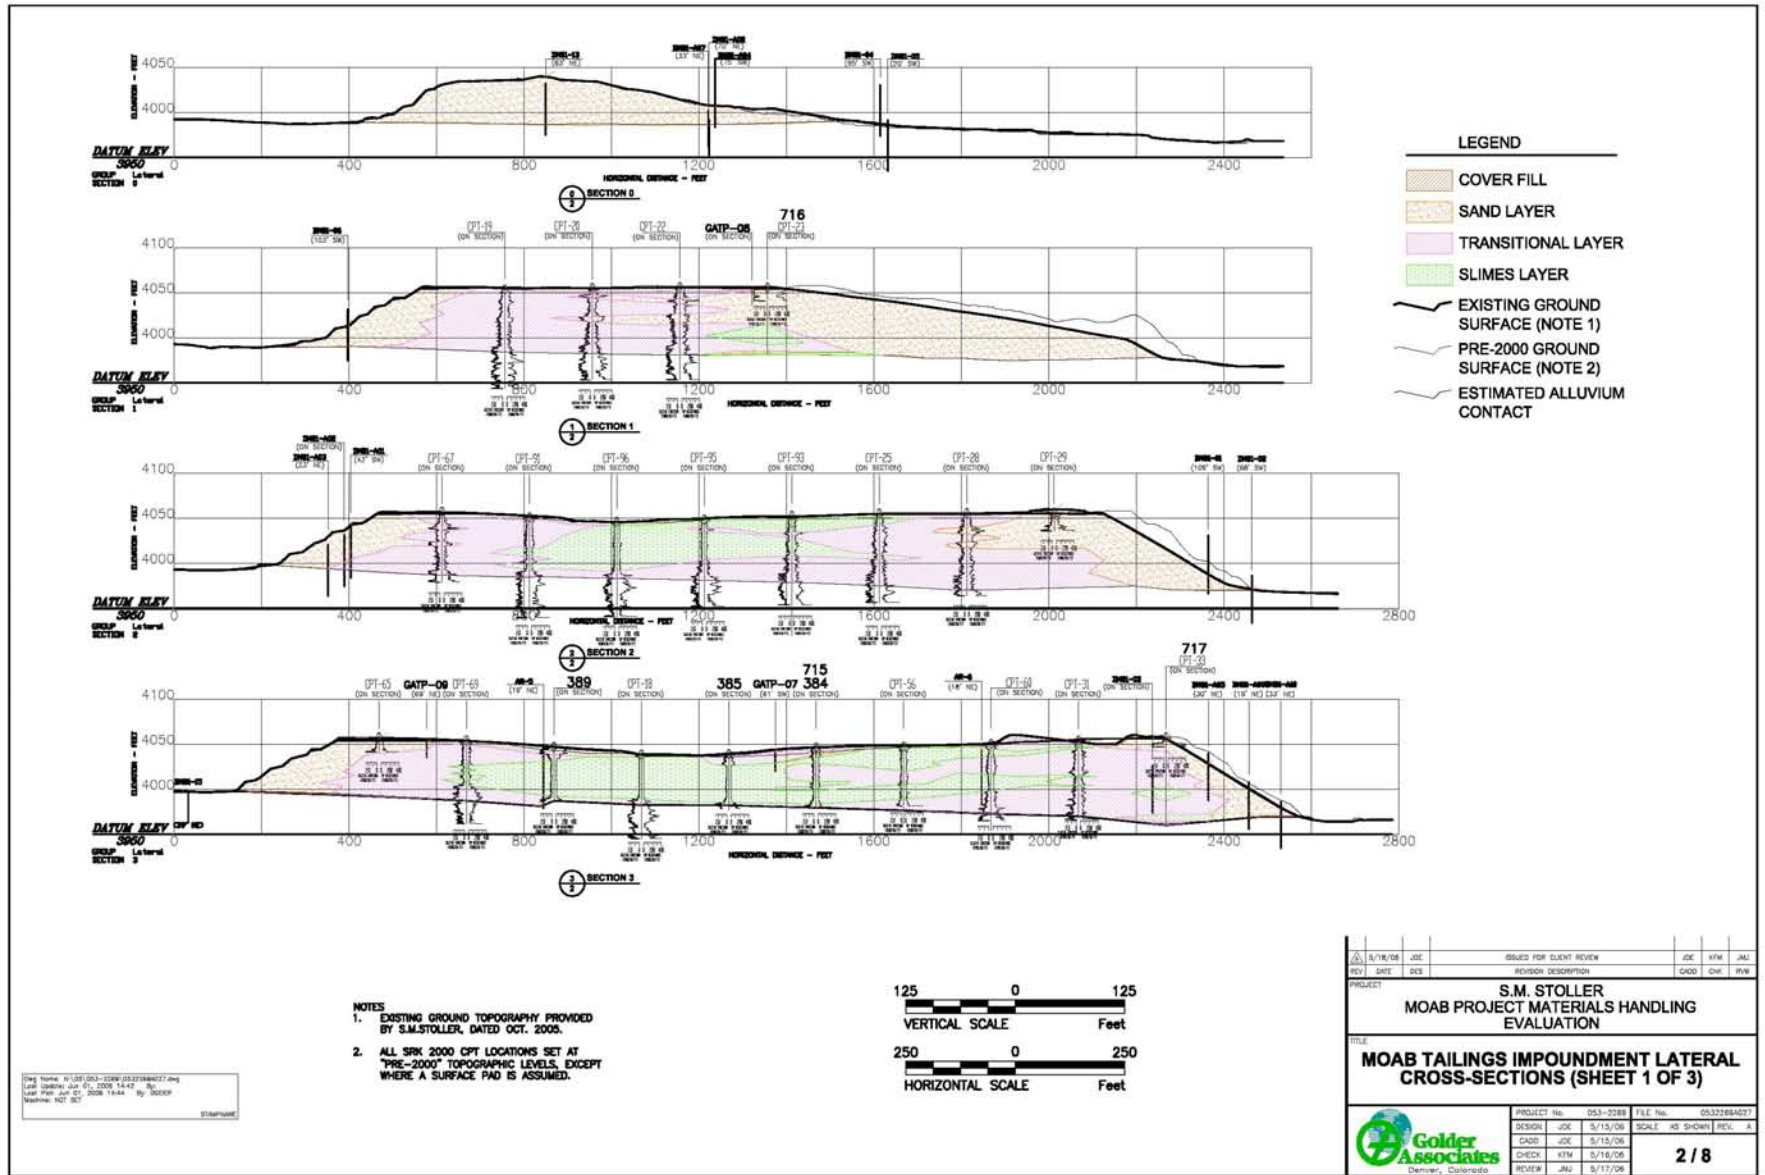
Moab Tailings Impoundment Lateral Cross-Section (Sheet 1 of 3)
